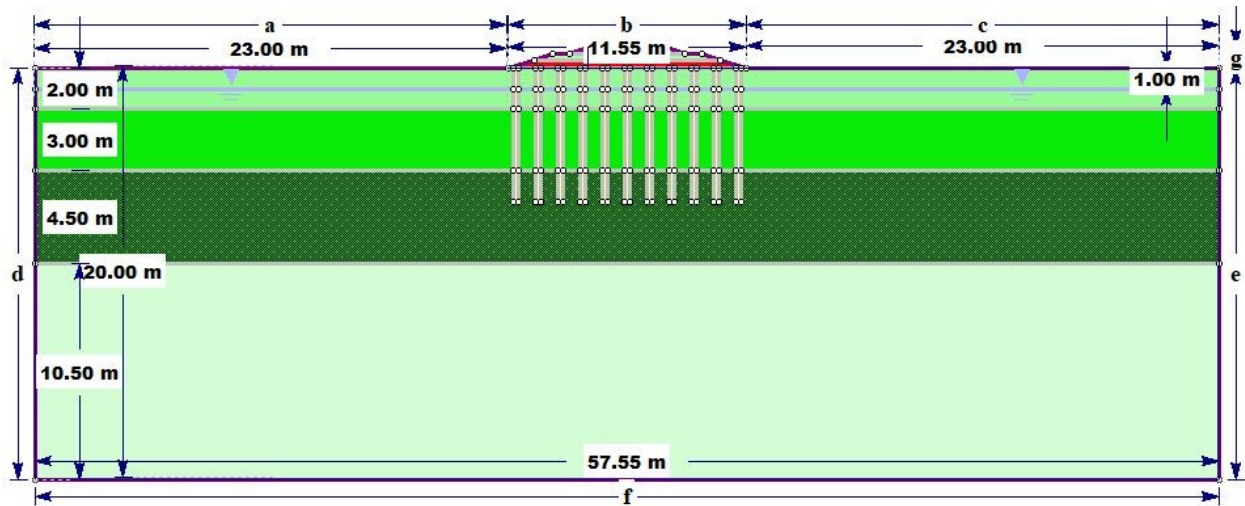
Cross-section of the pile-supported embankment for the model with dimensions (for 3H:1V slope ratio).
